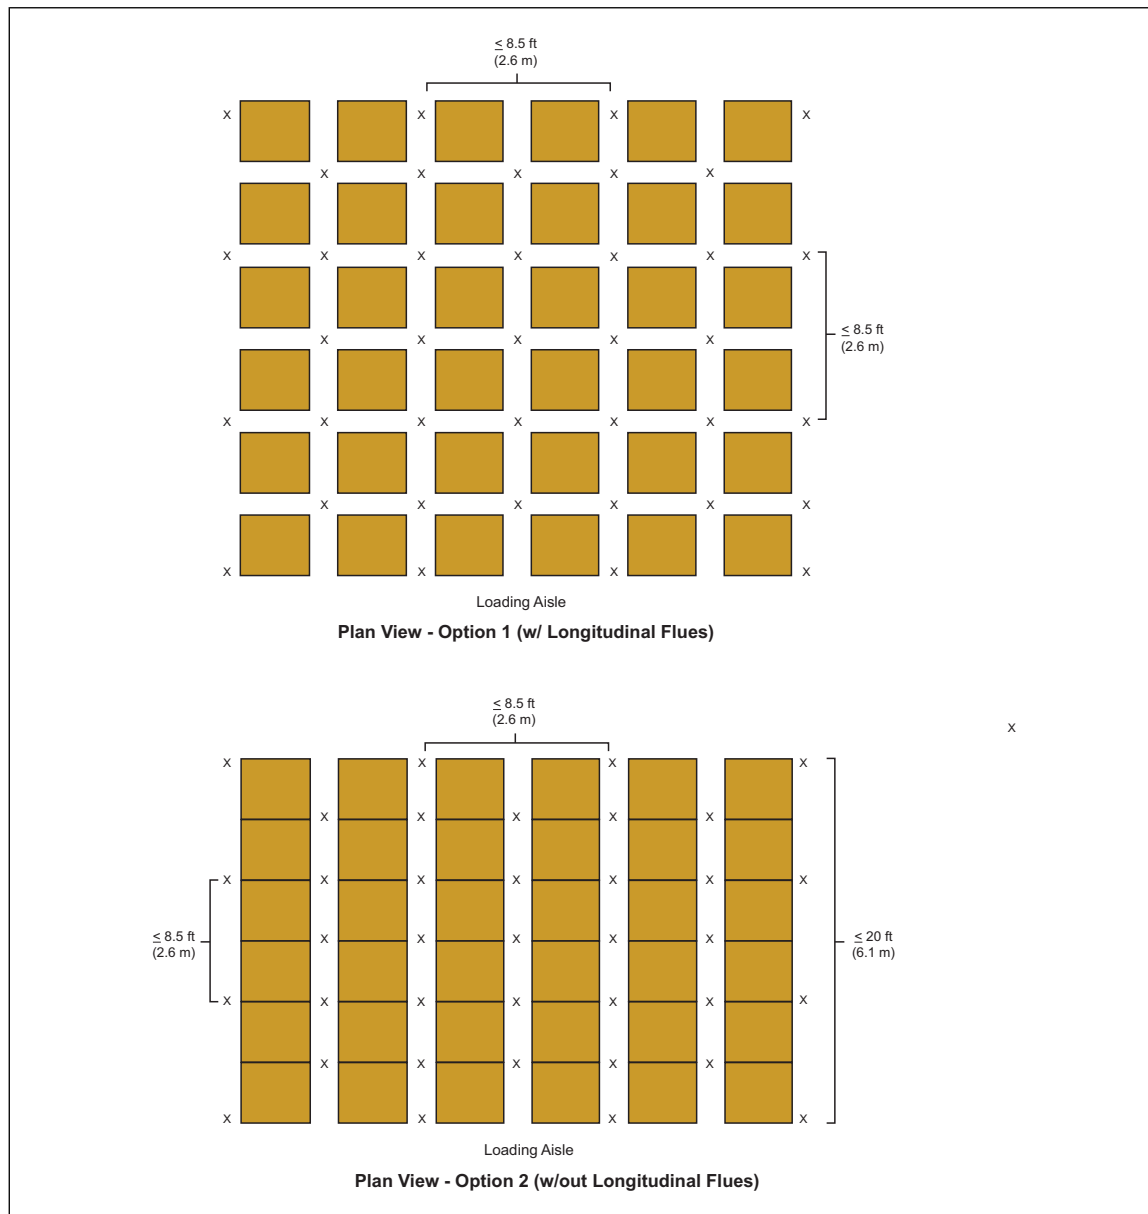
Plan view options of alternative in-rack sprinkler arrangement for multiple-row racks
